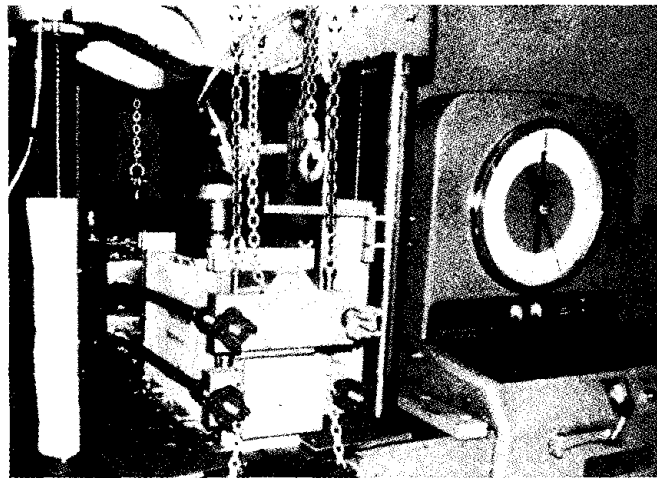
Full-Block Triplet Specimen in Riehle Testing Machine (300 kip)
